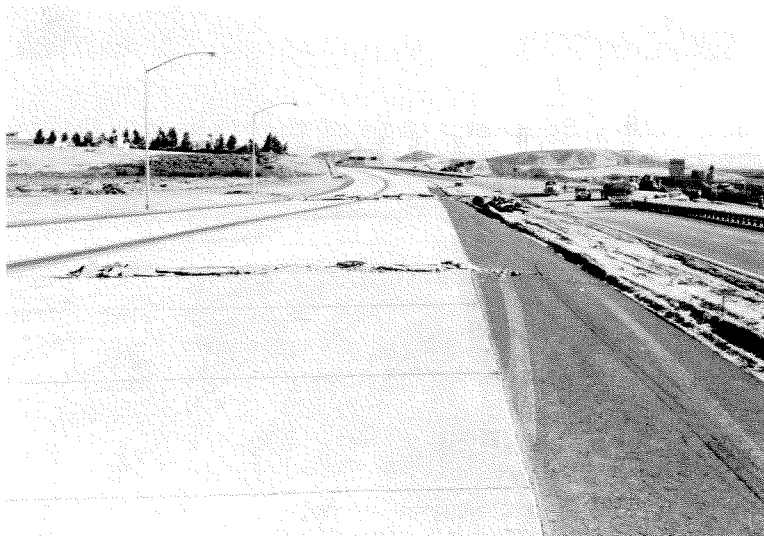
Pavement damage from ground movements. Looking south on the Golden State freeway north of the Roxford undercrossing.
